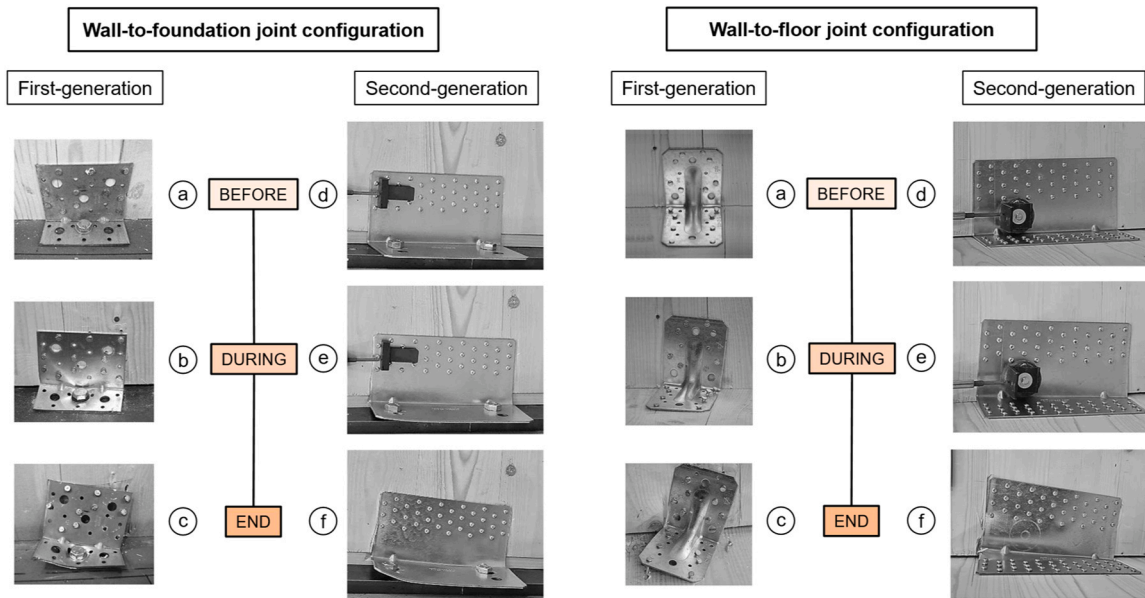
Traditional angle bracket in a wall-to-foundation and wall-to-floor joint configuration under horizontal-shear load: potential progression of failure modes observed during laboratory testing.
